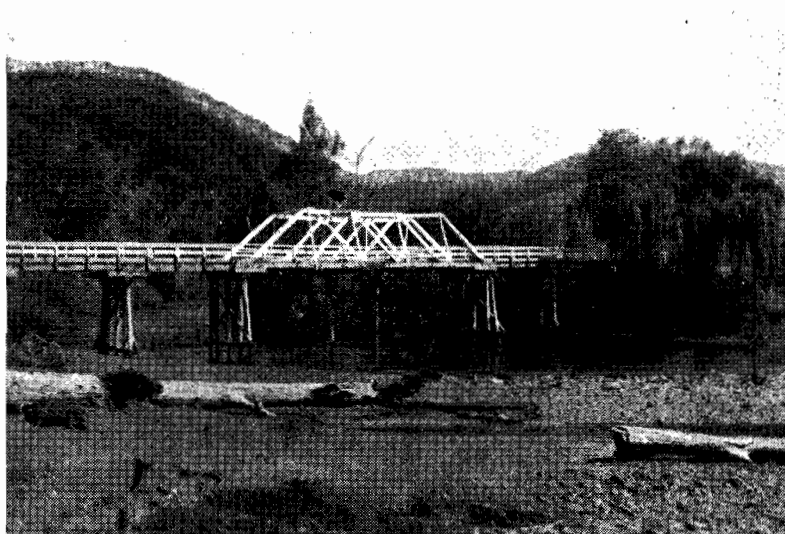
Maffra Shire—Licola Road.—Cheyne's Bridge, showing toms under timber truss.
